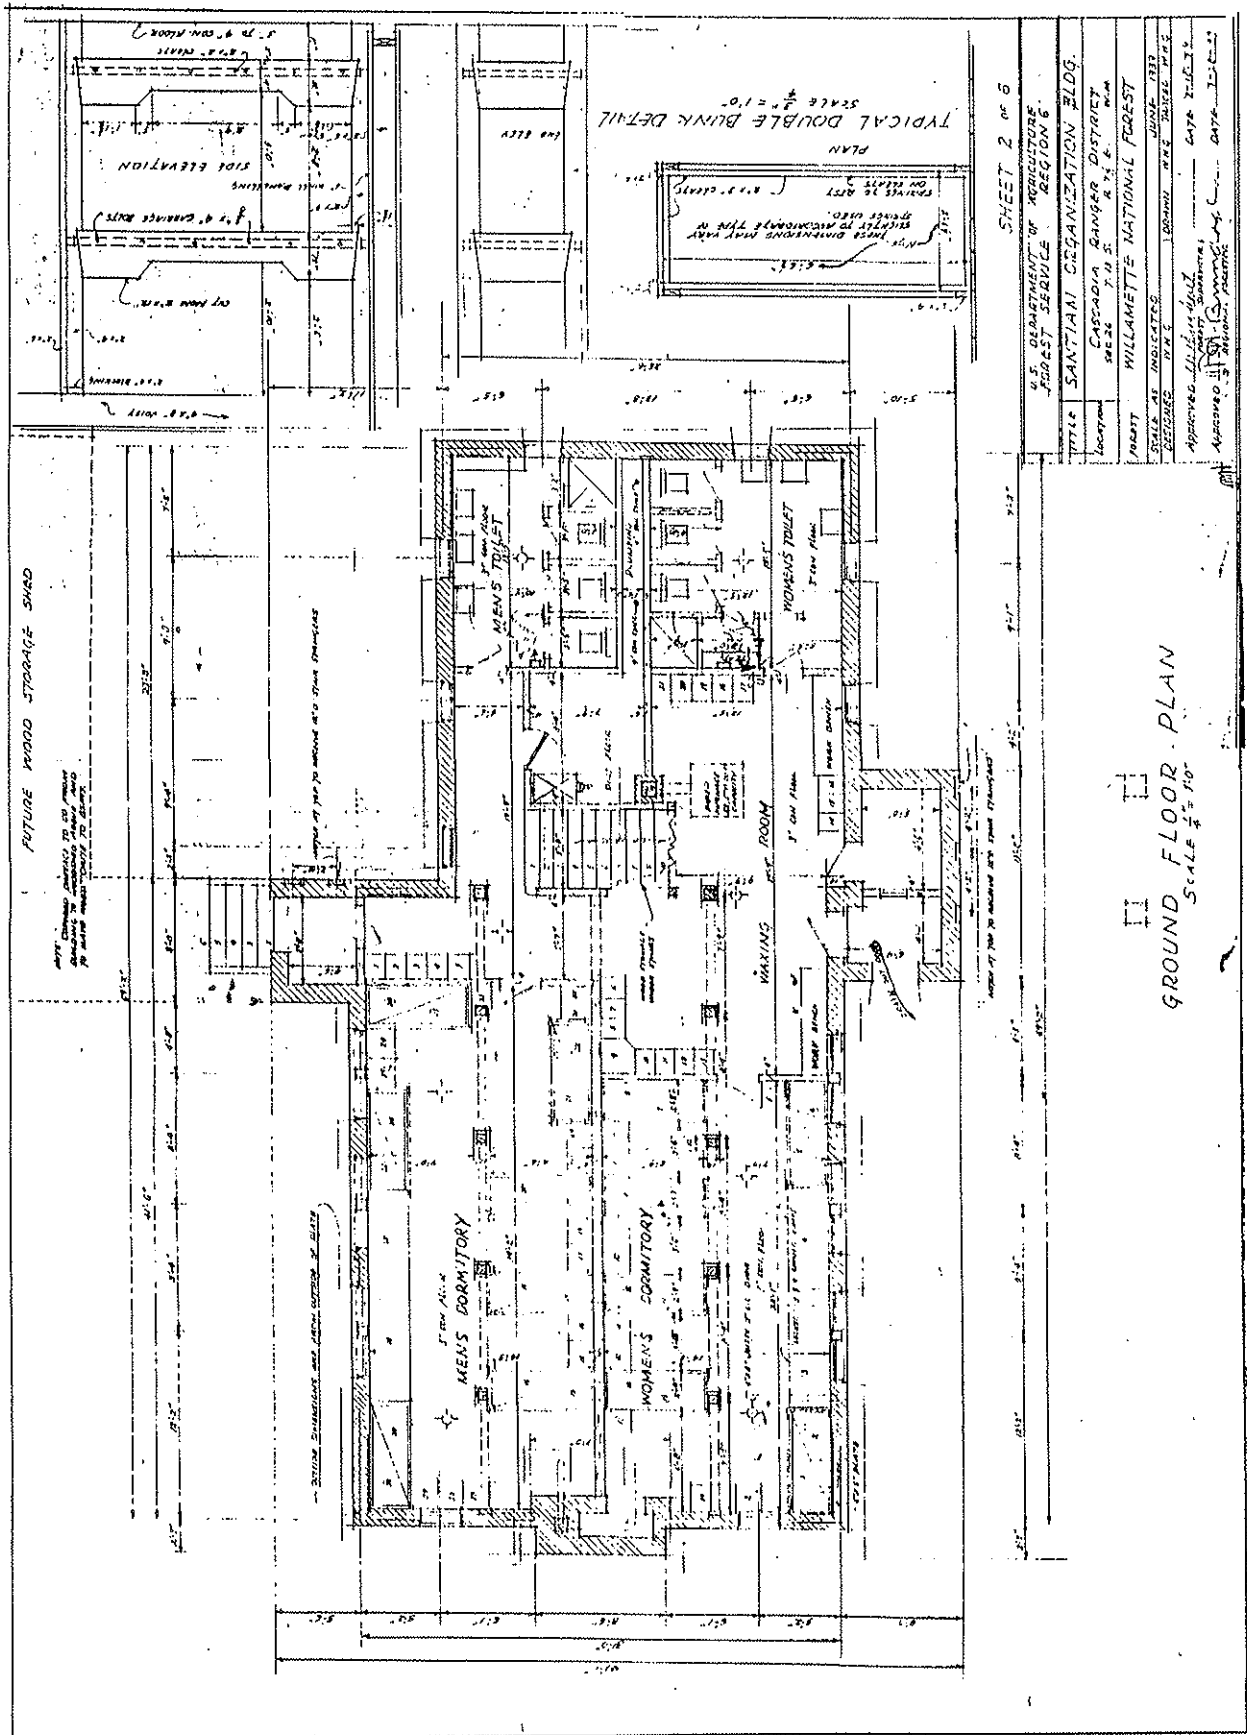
Santiam Organization Building: Ground Floor Plan (1939). Adapted from original prints on file at the Willamette National Forest. Note: Plans for future addition (woodshed) behind main structure. This actually became the Recreation and Dining rooms added the year following the completion of the main structure.
